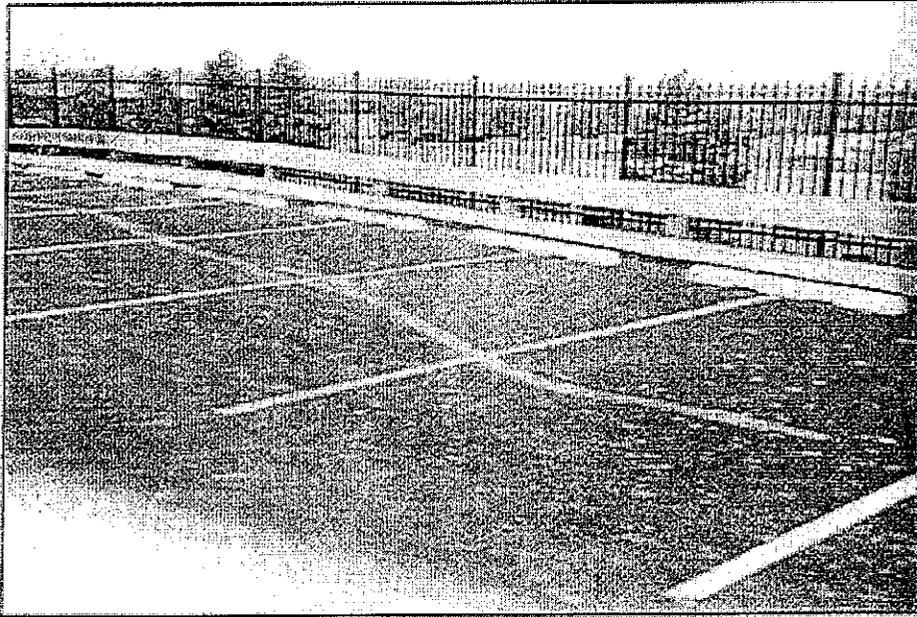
Examples of small and large surface cracks at end of SRW reinforced zone
